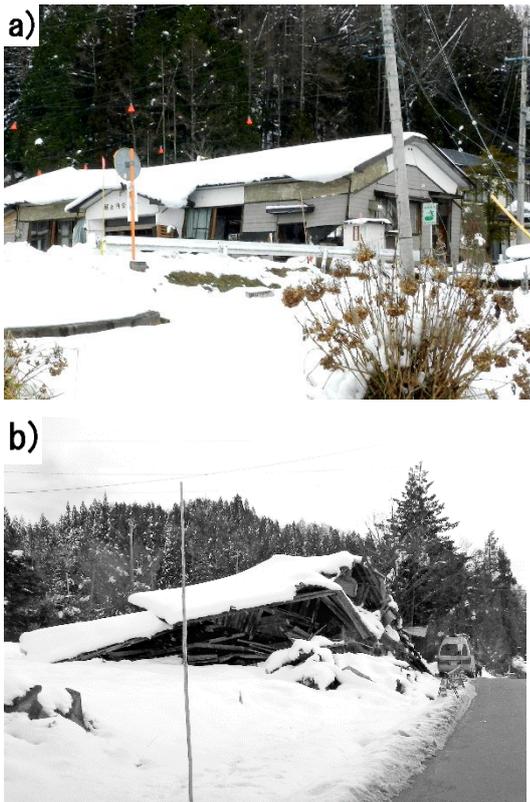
Damage of wooden house in Hakuba Village. Photo in Dec. 10, 2014.
